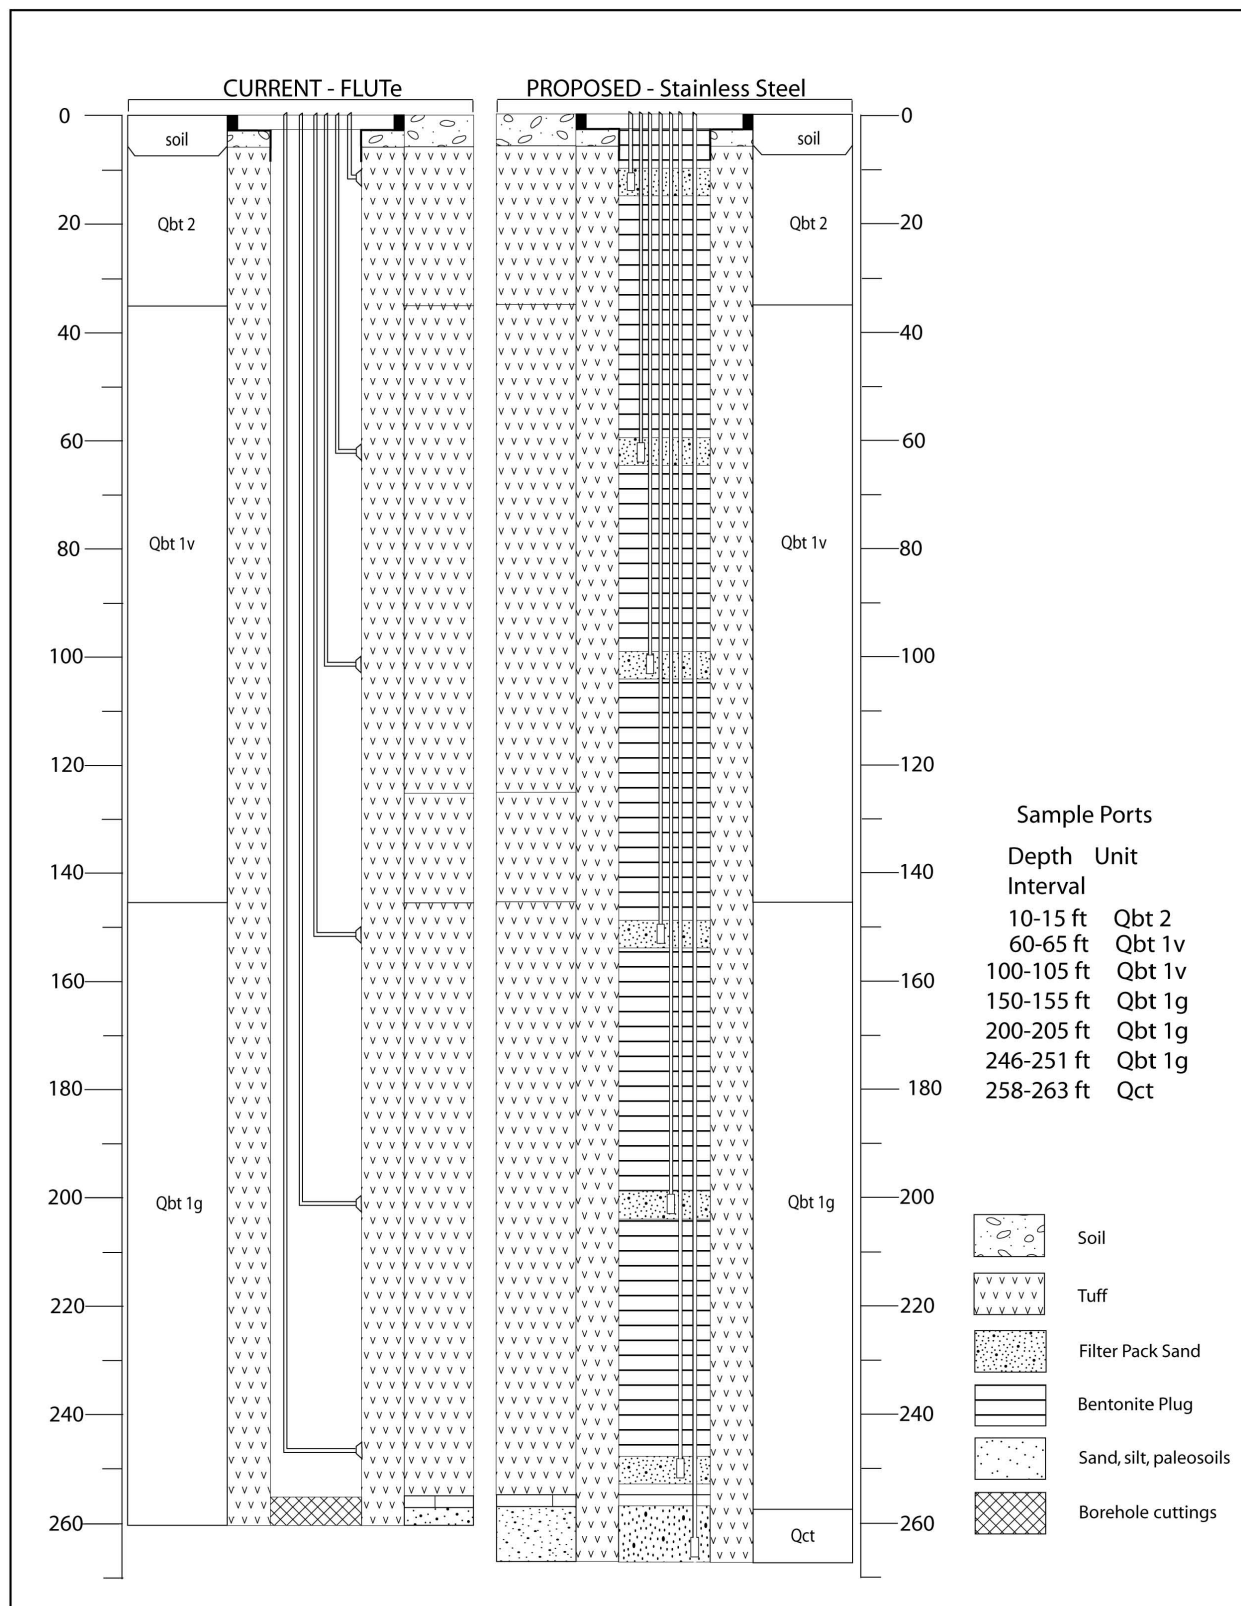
Proposed construction details of vapor-monitoring well 54-01023
